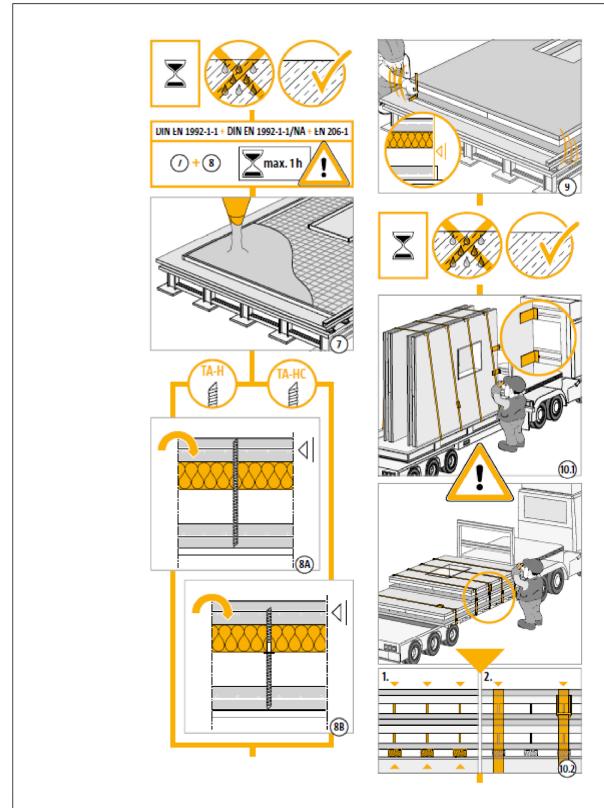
Installation instruction - Schöck Isolink® for element wall – page 2
